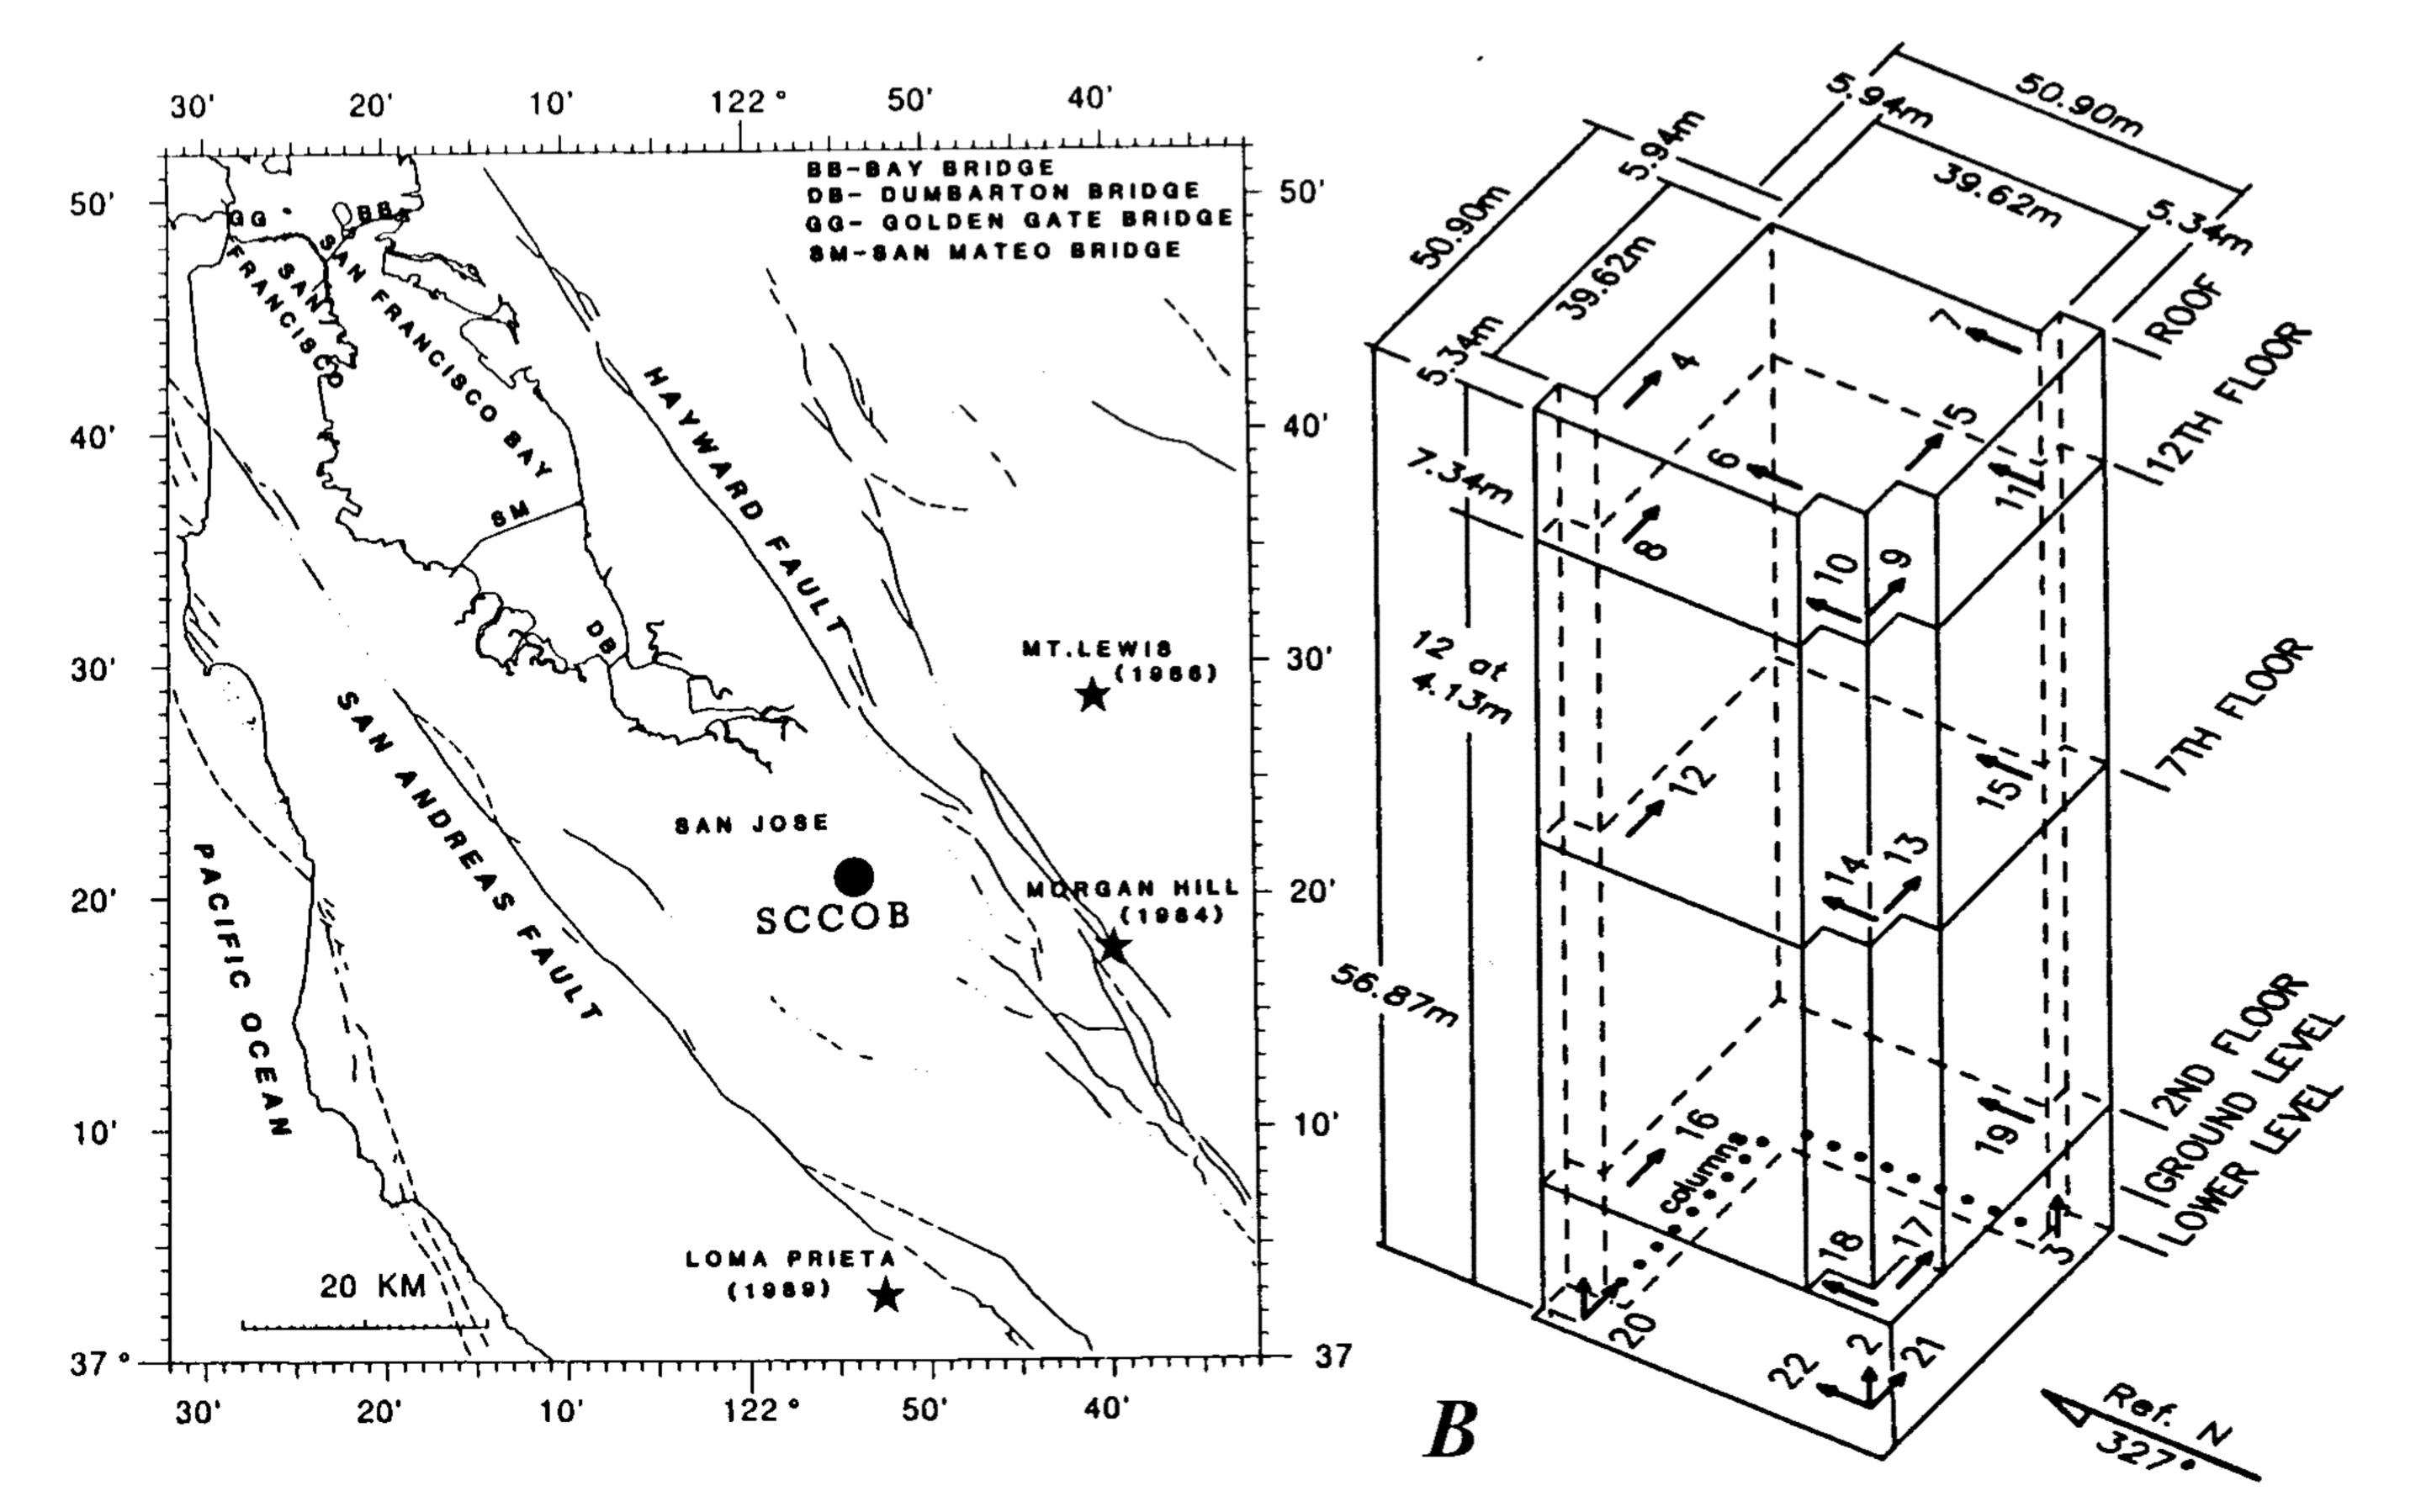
A, Santa Clara County Office Building (SCCOB). B, Location of Santa Clara County Office Building, its overall dimensions and instrumentation, and epicenters of three nearby earthquakes.
